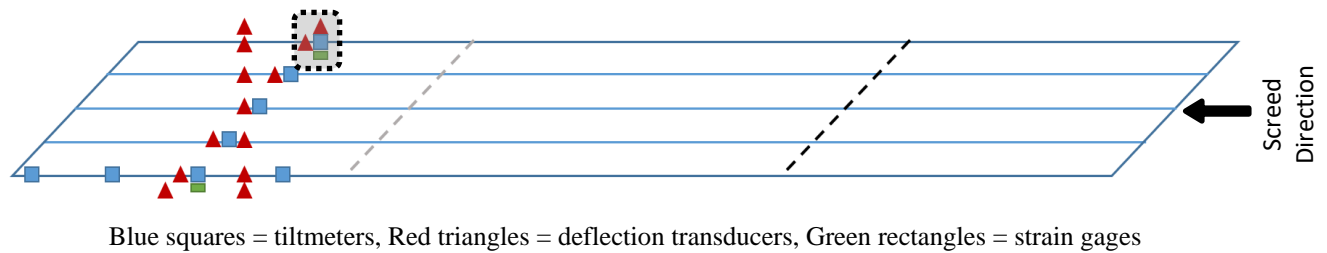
Instrumentation plan of the BNSF Railway Bridge
